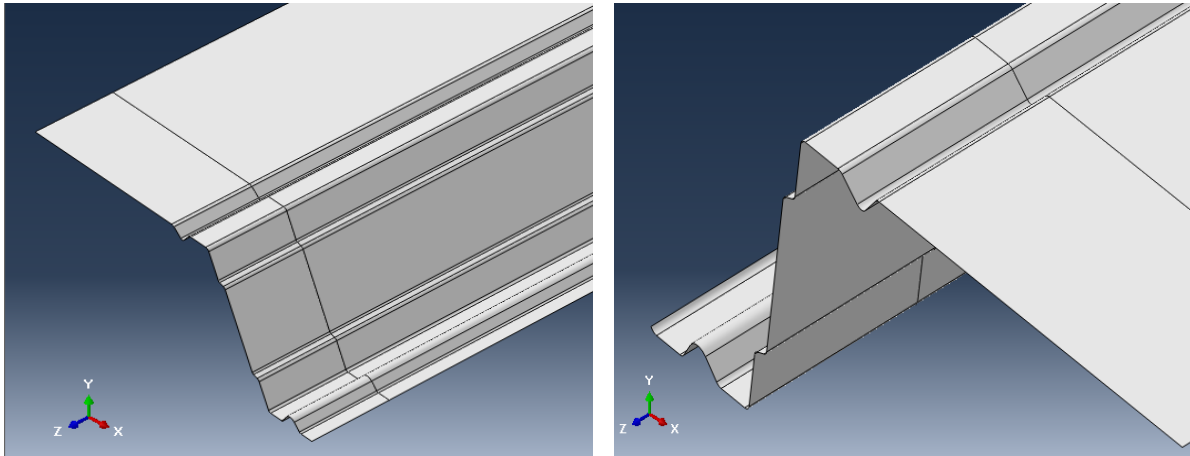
Parts of Trapezoidal Sheets modelled in Abaqus
